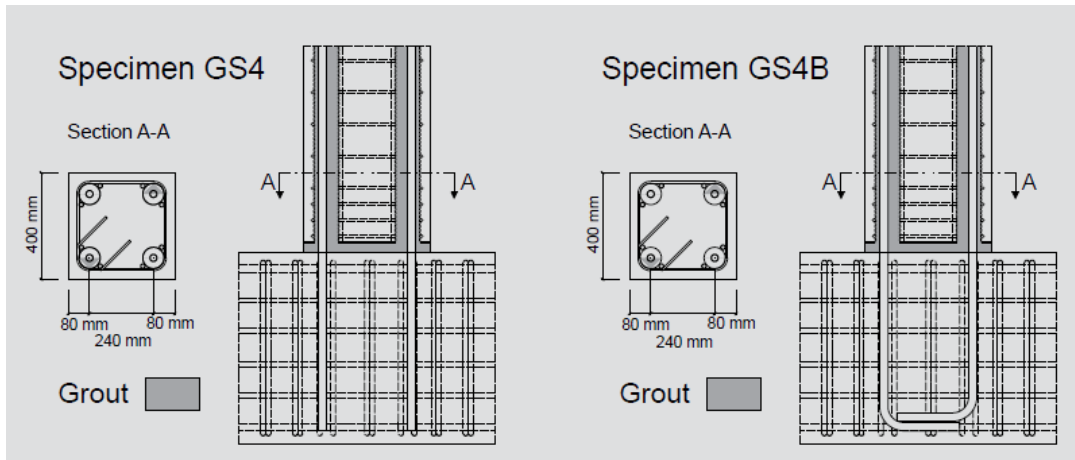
Details for column-to-foundation connections retrofitted with grouted corrugated steel sleeve connections (Belleri and Riva 2012)
